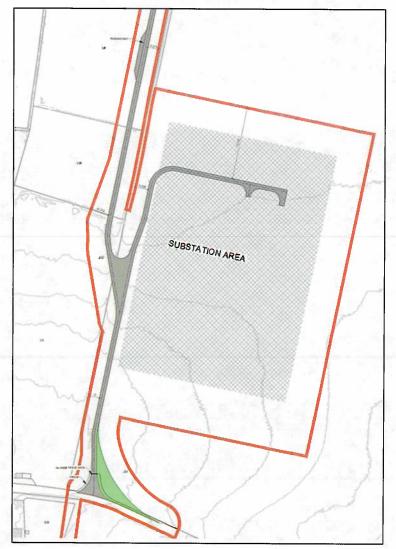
Proposed site layout (as submitted – Site Layout Sheet 3).
